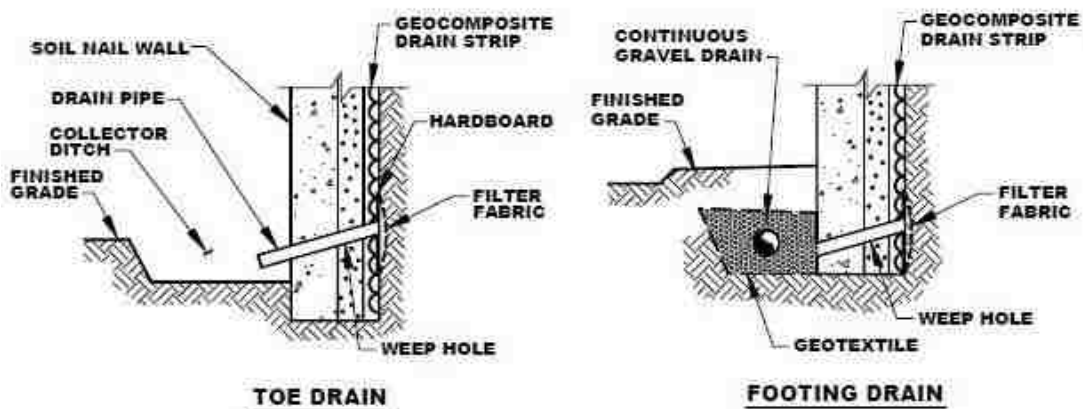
Typical drain pipe details to provide groundwater control in soil nail walls (Byrne et al, 1998)
